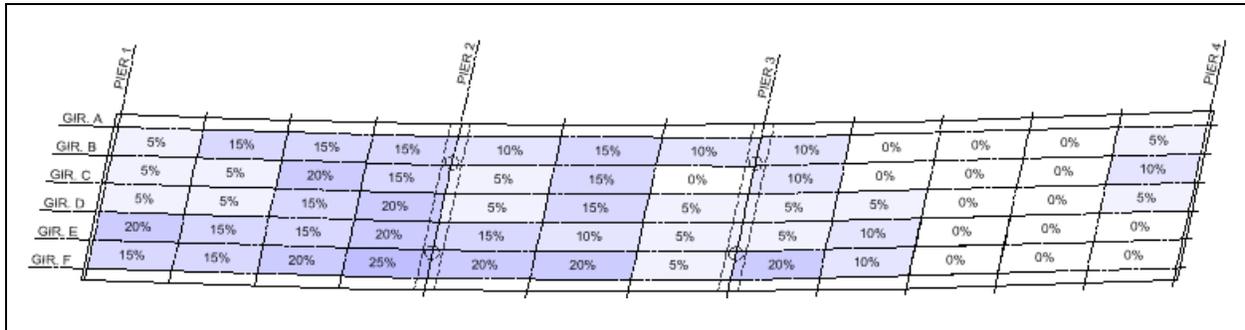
Bridge 5/234W Crack Intensity Diagram
